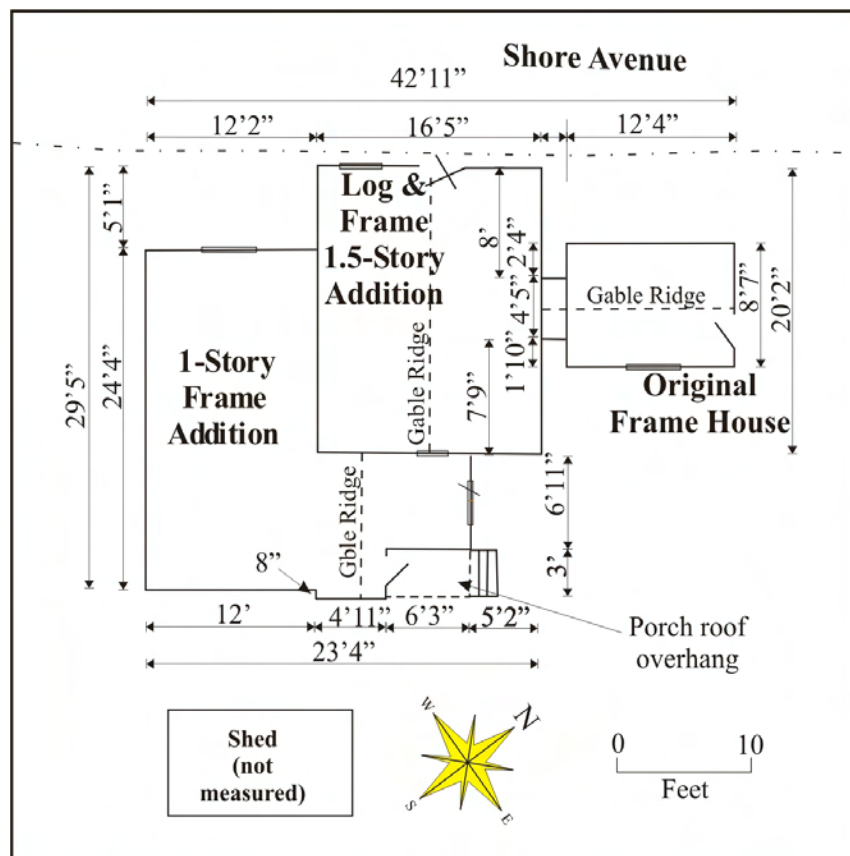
Plan of John Gregg House at 705 Shore Avenue.
